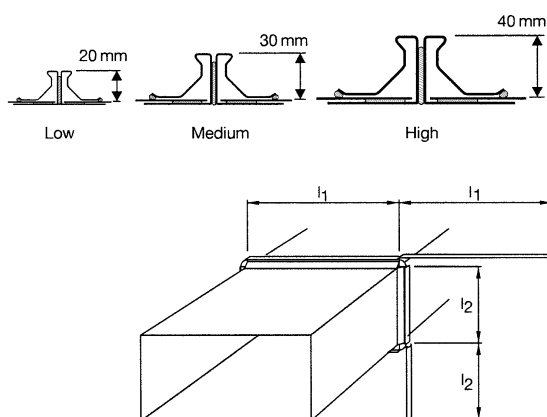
Slip joints on rectangular ducts add to the space requirement. At installation free space has to be available for the joint connection.
